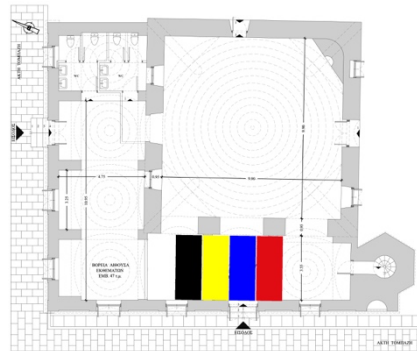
Floorplan of the existing building with the location of the colored boxes.
